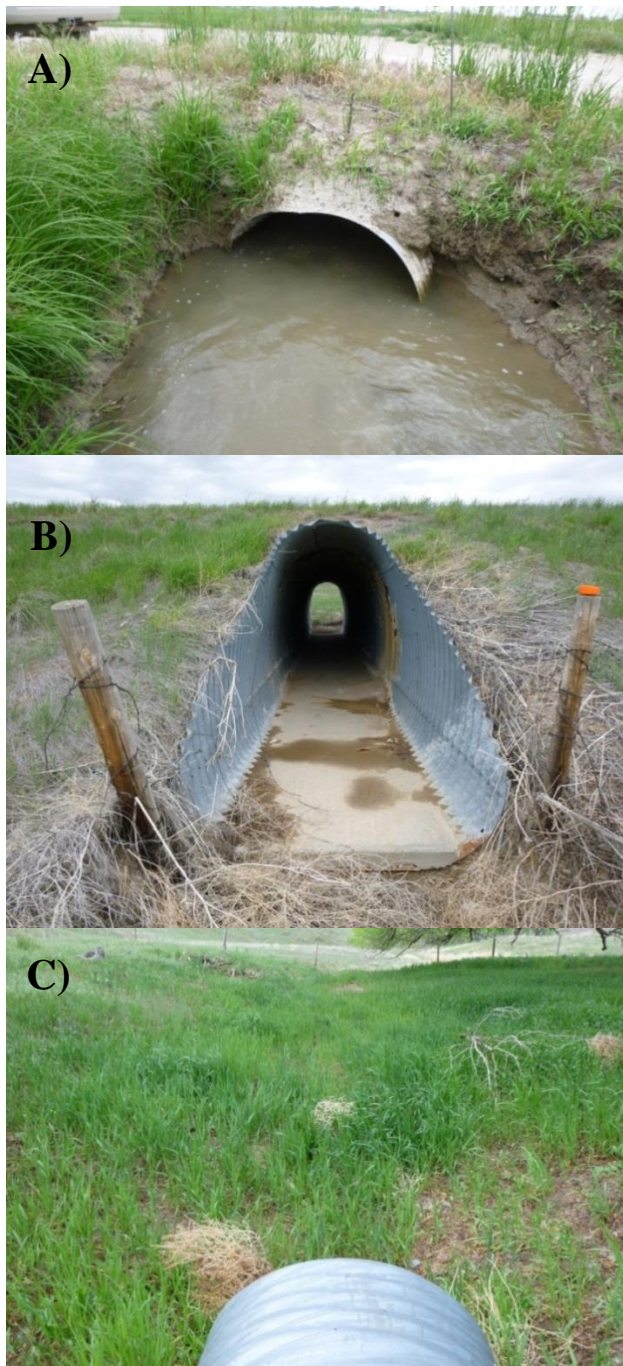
A) Irrigation Culvert B) Underpass Culvert C) Drainage Culvert
